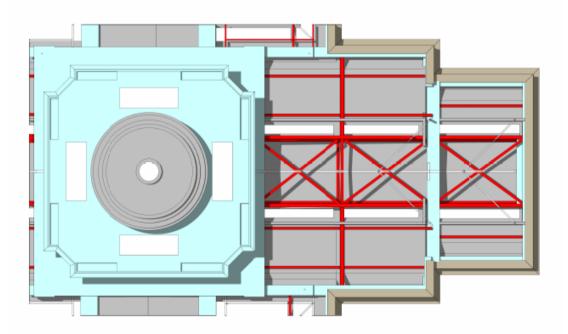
Part plan - view of the concrete works around the dome and steel roof bracings over the West Wing
